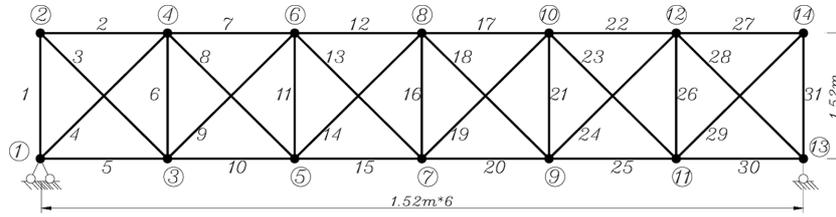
Finite element model of a simply supported, 6-bay planar truss
